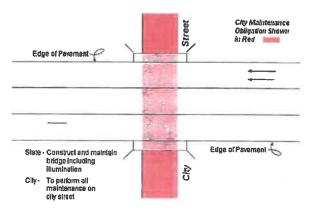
EXISTING CITY STREET CROSSED BY NEW STATE HIGHWAY OVERPASS
